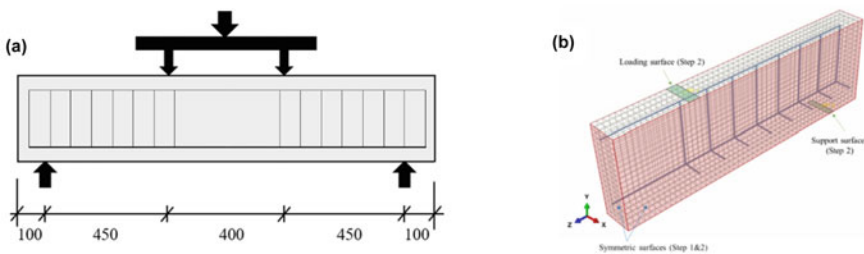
Geometric and boundary conditions of the reinforced concrete tested by Fan and Hanson [7]
